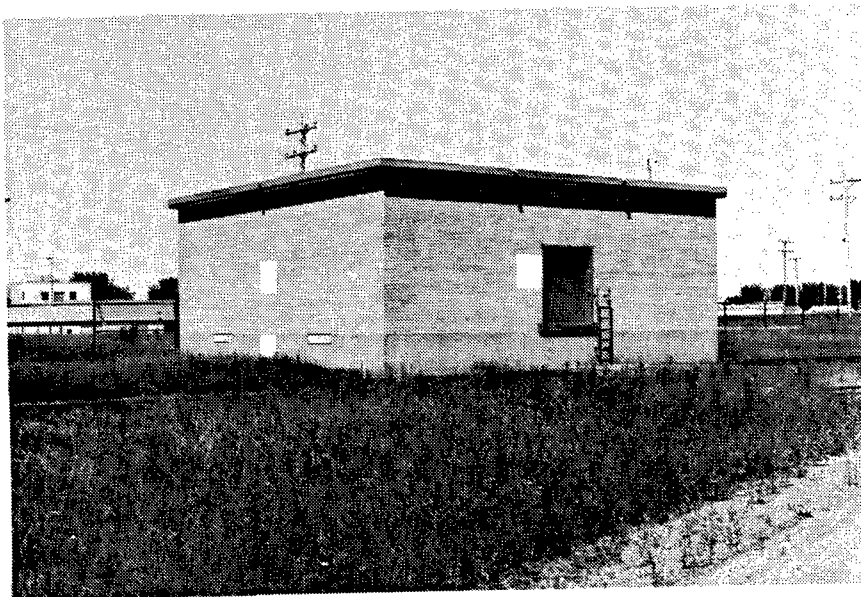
Building 125: Rail loading door on this Small Arms Pyro Magazine.
